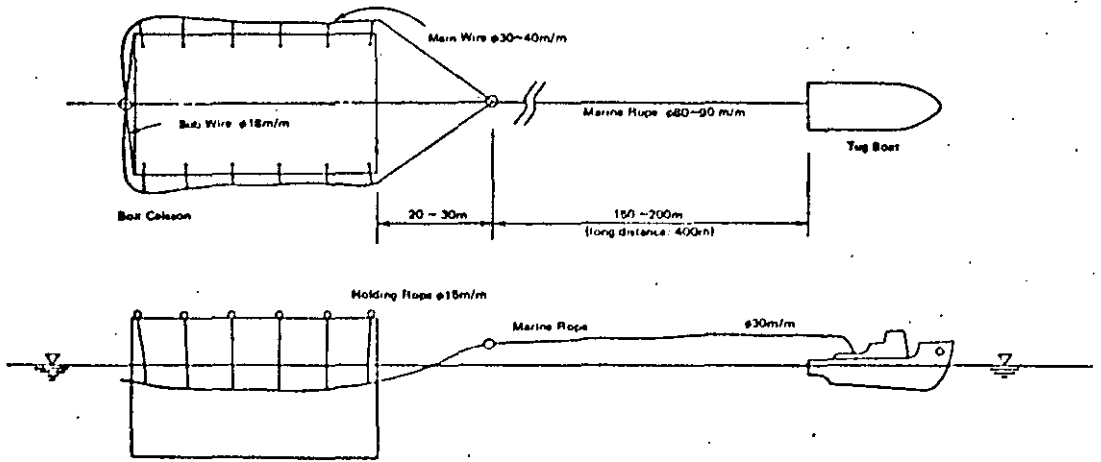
Towing Operation of Box Caisson by Rounded Rope Method
